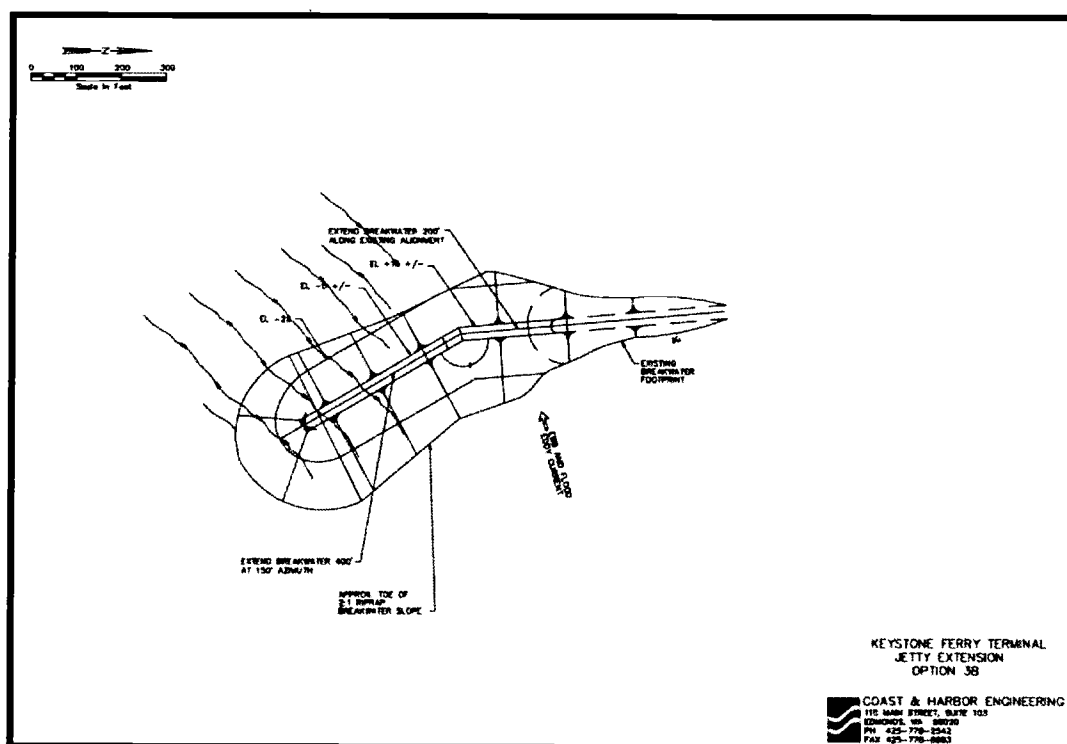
Design drawing of proposed jetty Alternative 3B. Courtesy of CHE.
